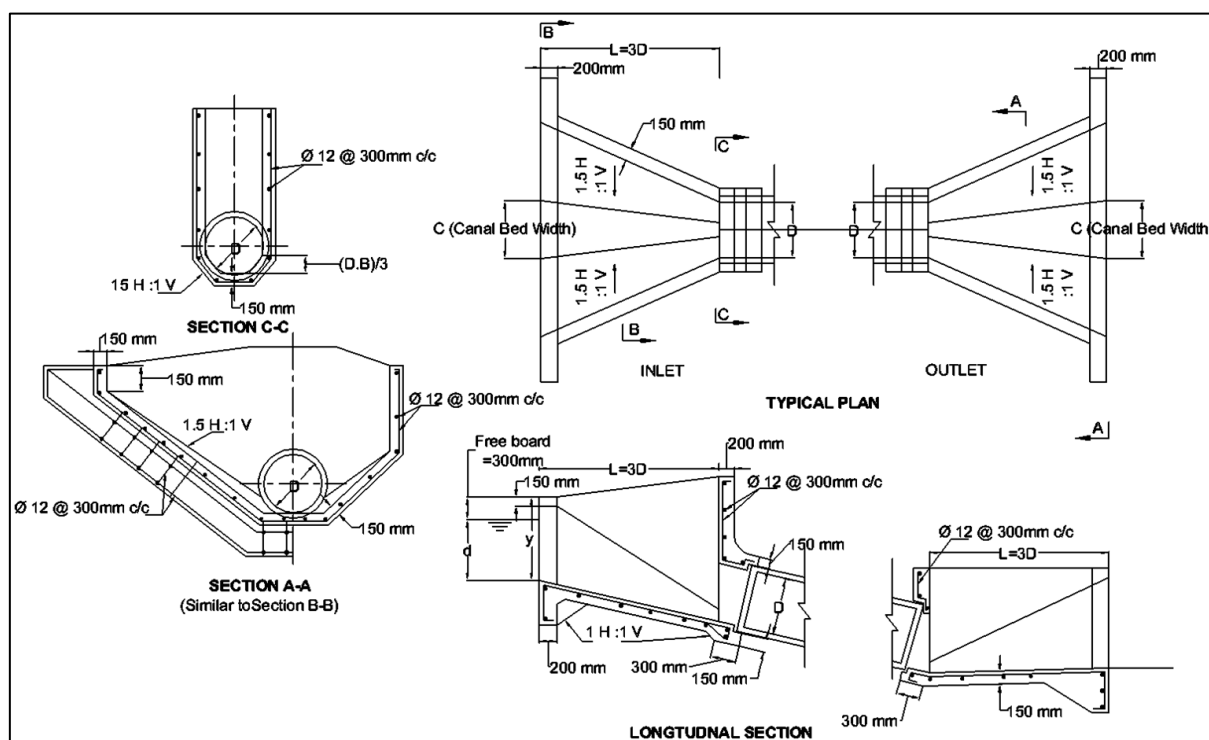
Drawings of broken back concrete transition (Type-I) inlet & outlet
